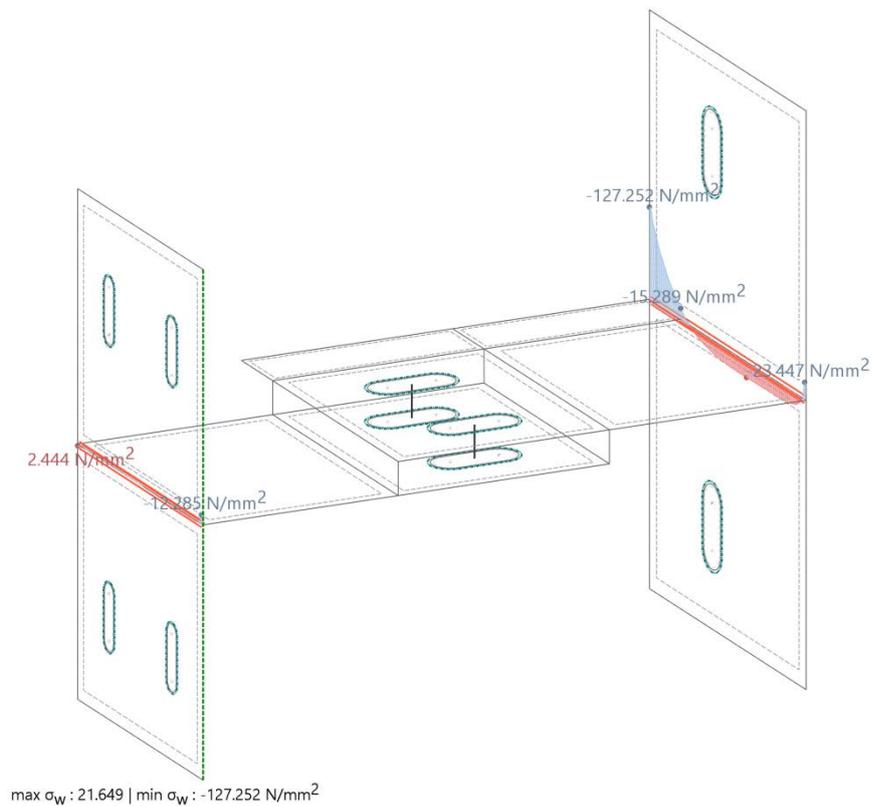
Existing stresses in the weld seam (extract from RFEM 6.02)
